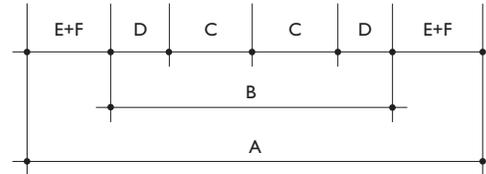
Typical 55-foot Right-of-Way Neighborhood Street section
